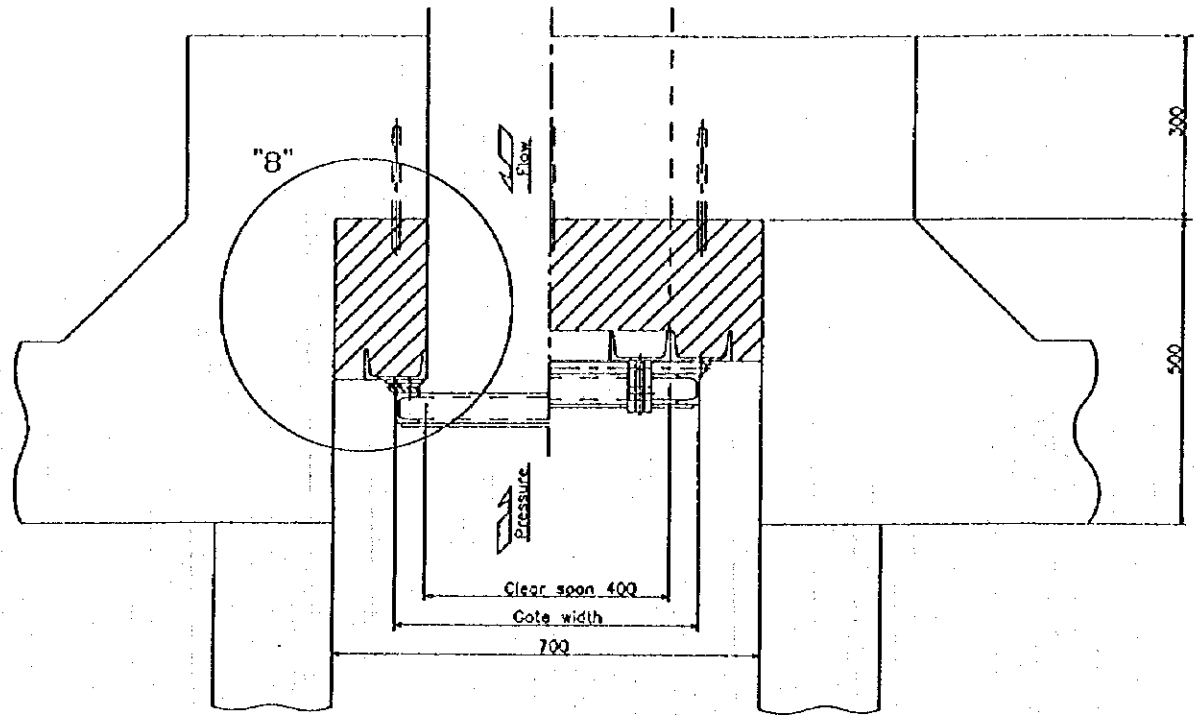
DETAIL OF TOP AND BOTTOM SLOT SCALE B
